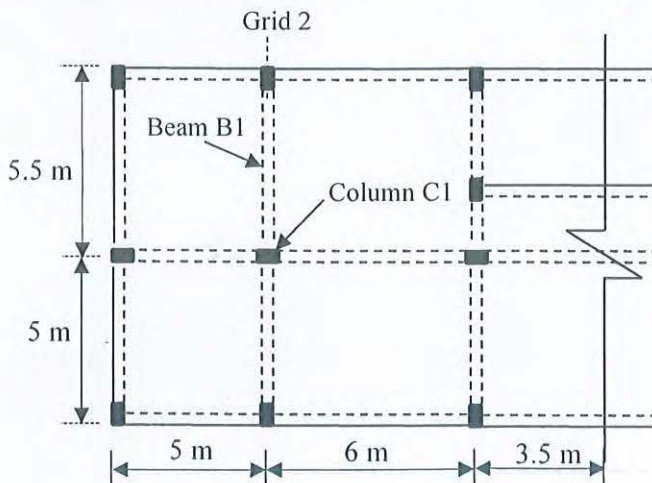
Floor Layout Plan of 9 Storeyed Medical Institute (Half of the floor plan)
